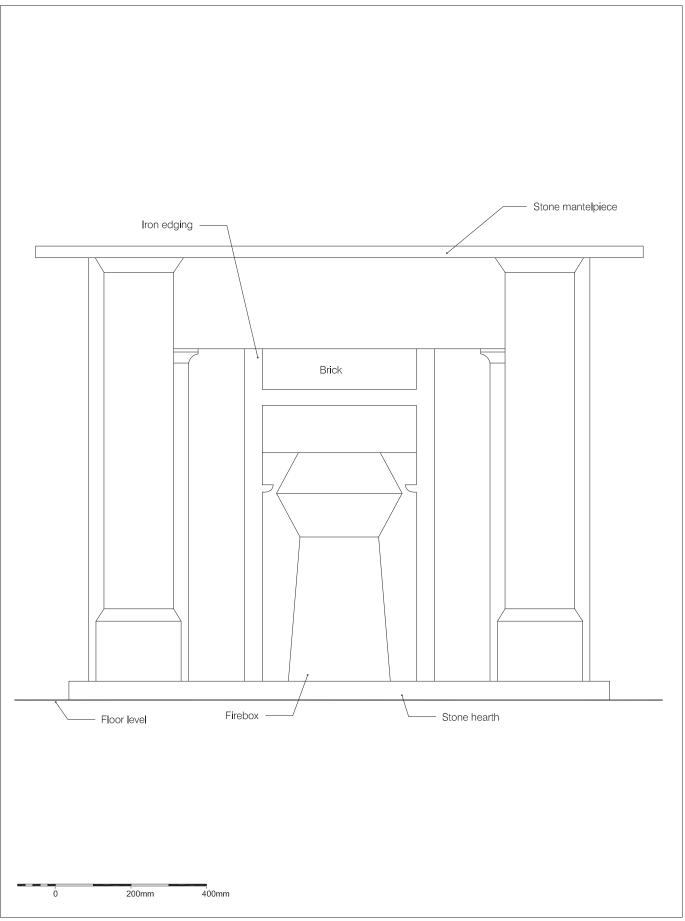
Detail of East Fireplace, Room CF03G1 Coal and Fish Offices 1:10 at A4
